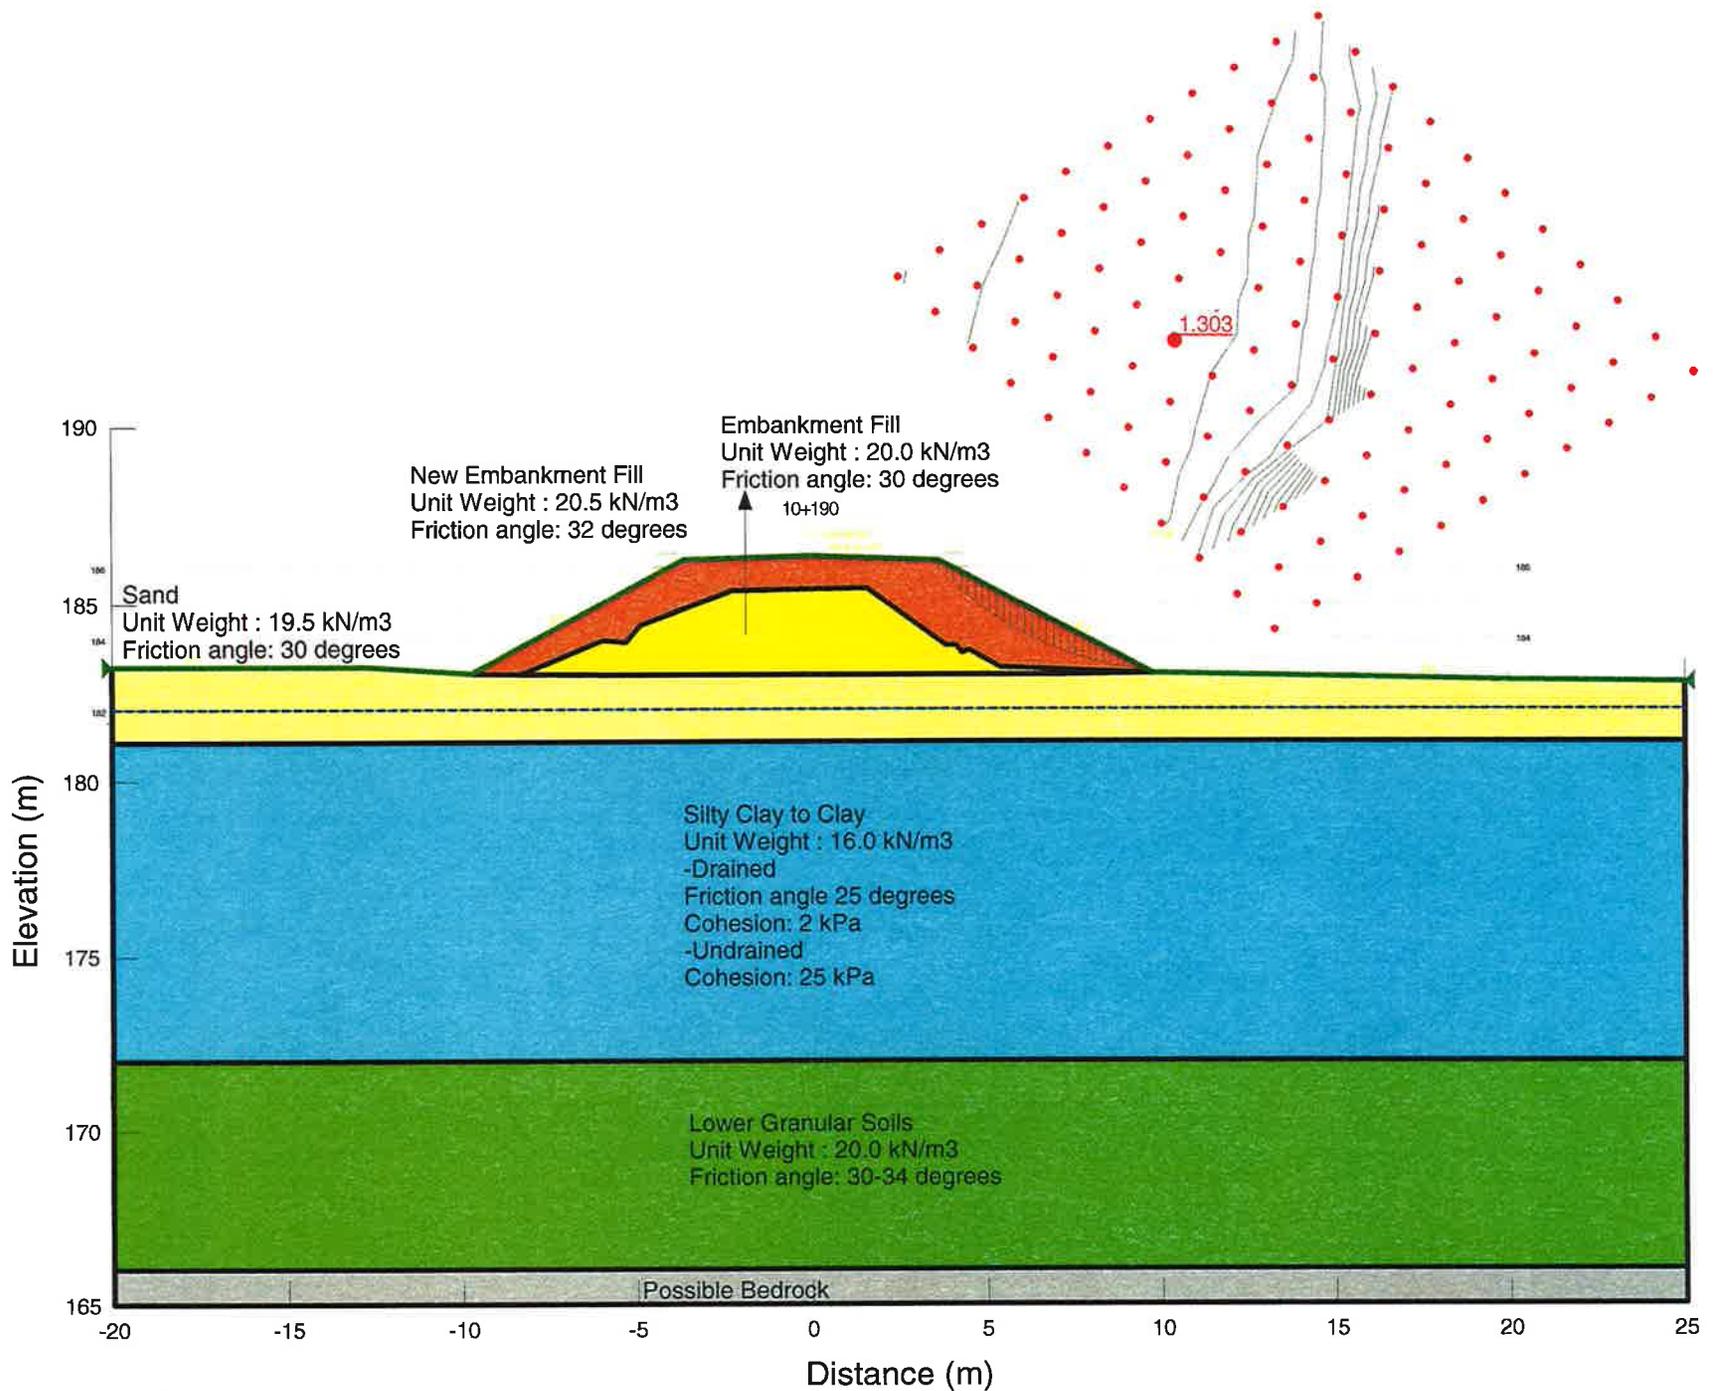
Stability analysis @ STA. 10+190 with 0.8 m surcharge (north abutment location) for concrete bridge option
